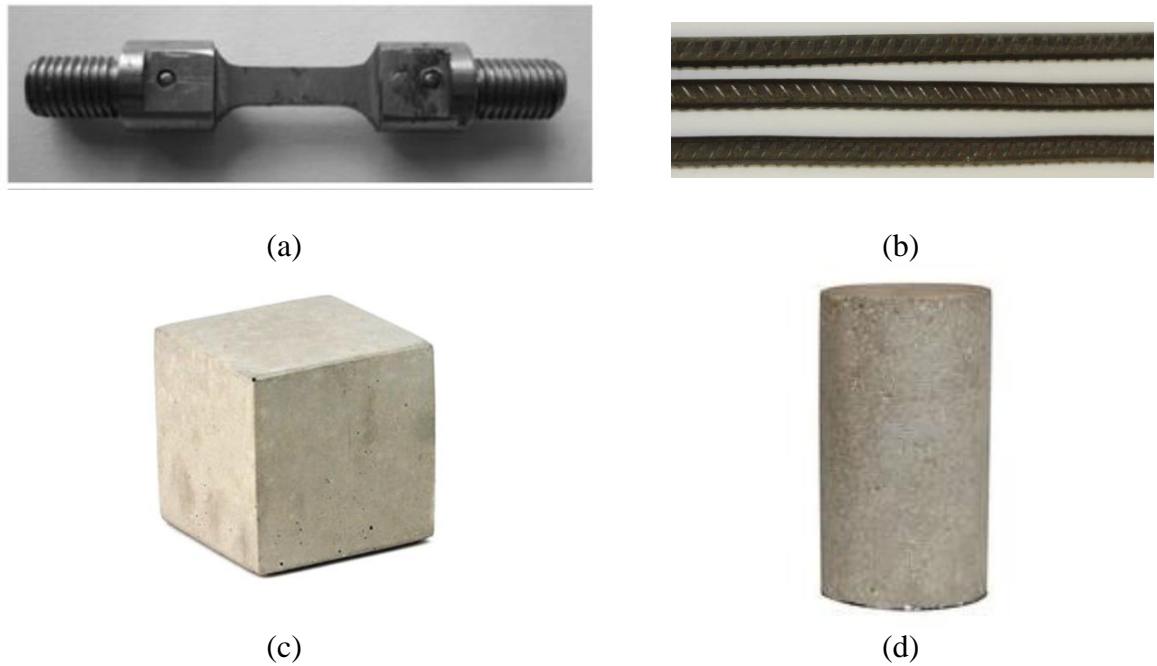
Typical specimens used for studying material behaviour (a) dog bone and (b) reinforcing bars (c) concrete cube and (d) concrete cylinder.
